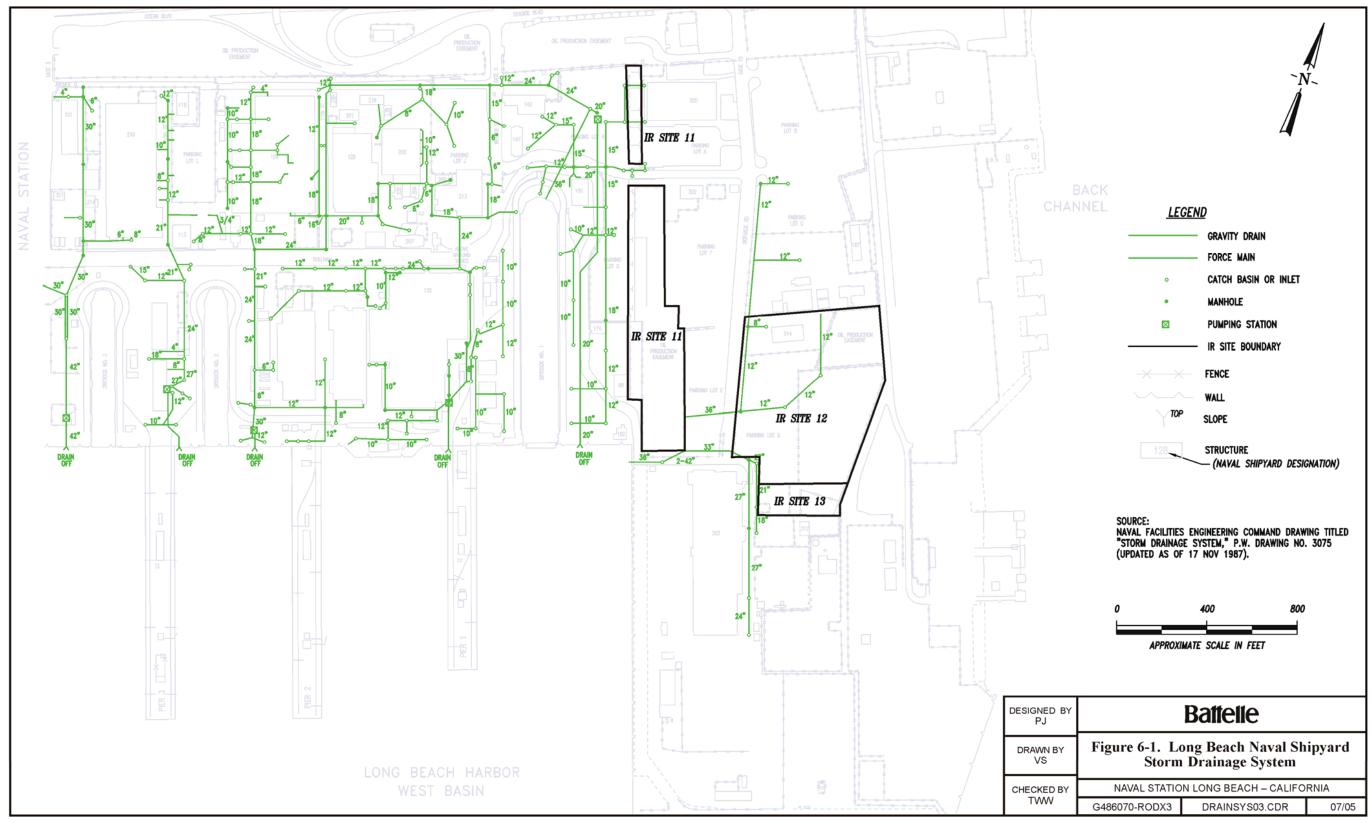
Long Beach Naval Shipyard Storm Drainage System
